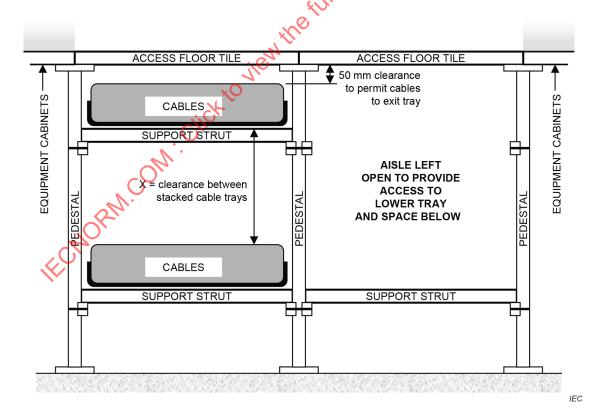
Example of uncovered (accessible) row of floor tiles to provide access to lower tray
